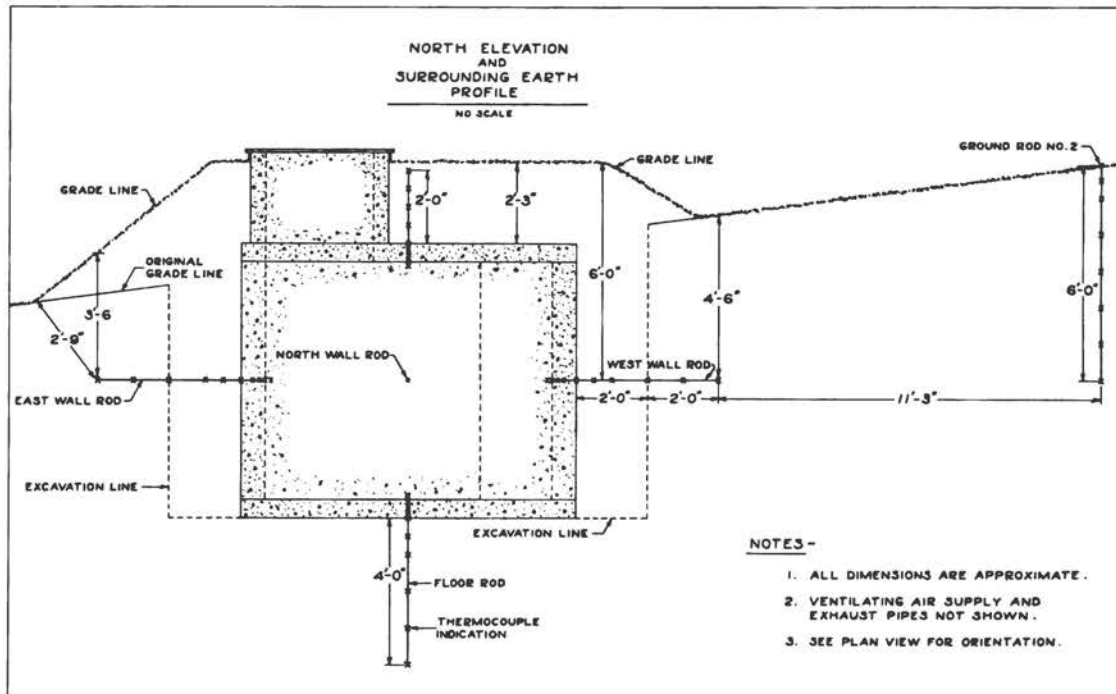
North elevation of prototype underground fallout shelter showing profiles of earth over shelter and nearby unexcavated earth
